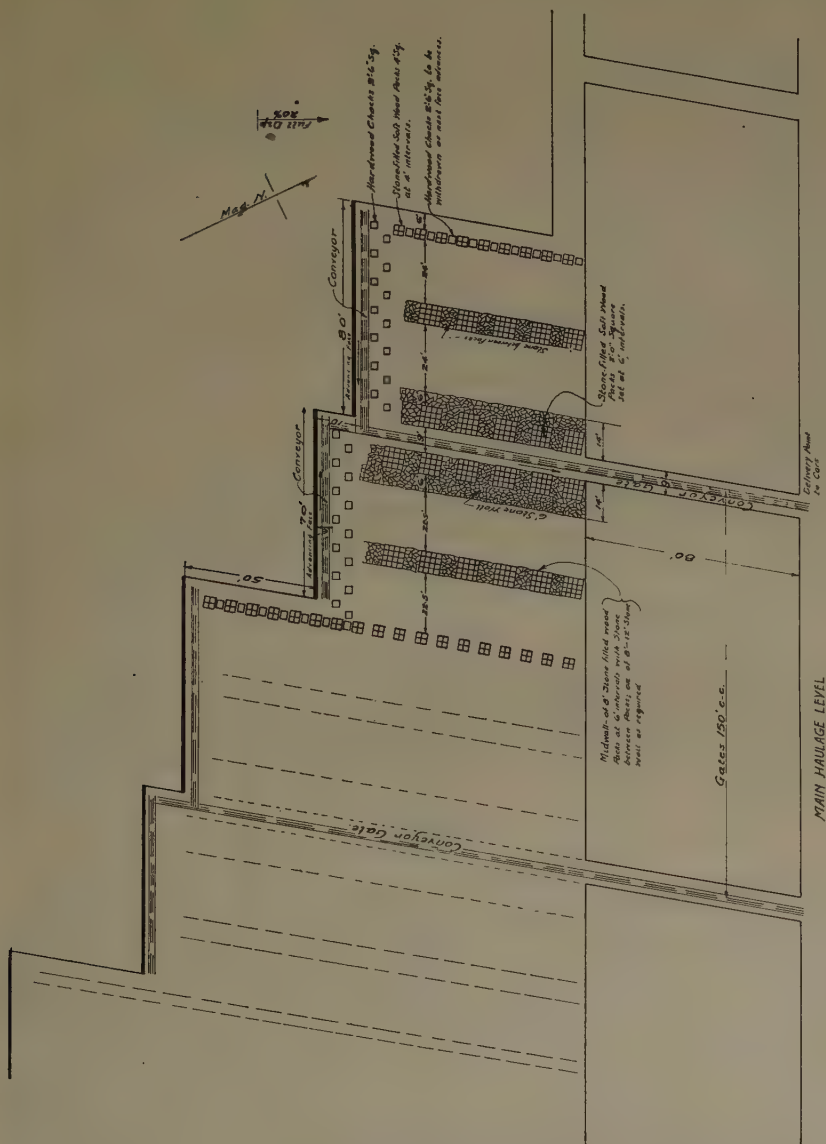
Proposed system longwall extraction, colliery 16; staggered T-face advancing longwall.
